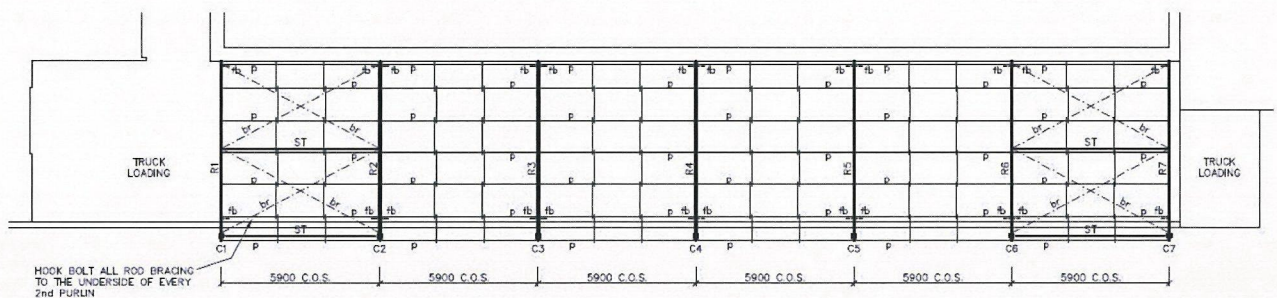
Length of the proposed awning (Source: Development Plans prepared by Xeros Piccolo)
